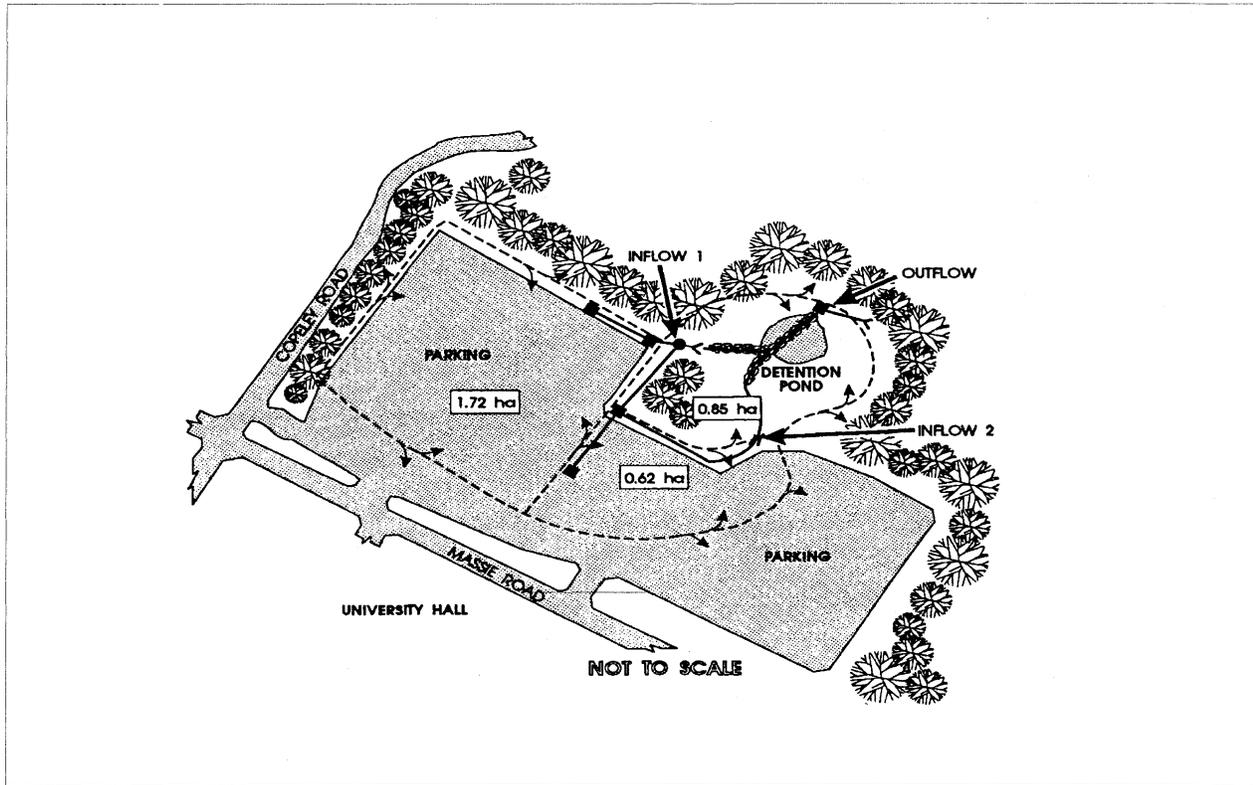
Sketch of Massie Road parking lot and detention pond (Yu et al., 1993)
